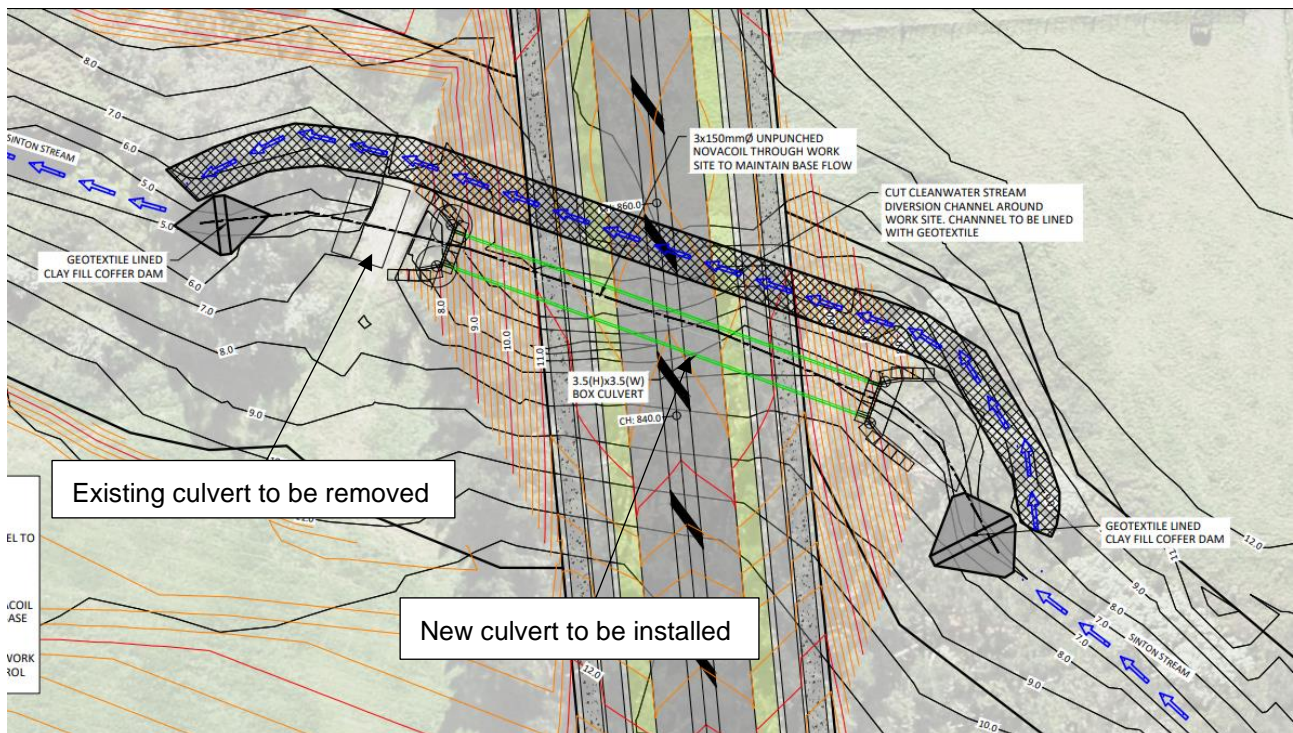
Temporary stream diversion plan for Sinton Stream culvert installation (snip from Drawing No. SK016B, Crang Civil Consulting Engineers, provided in Appendix A).
